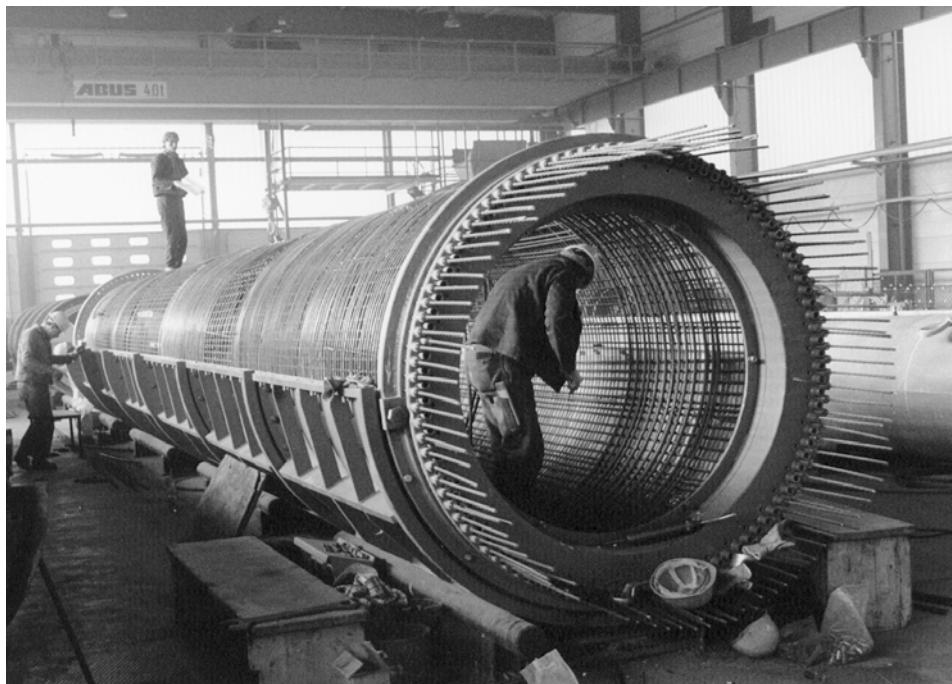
Manufacture of centrifugally-cast concrete towers
